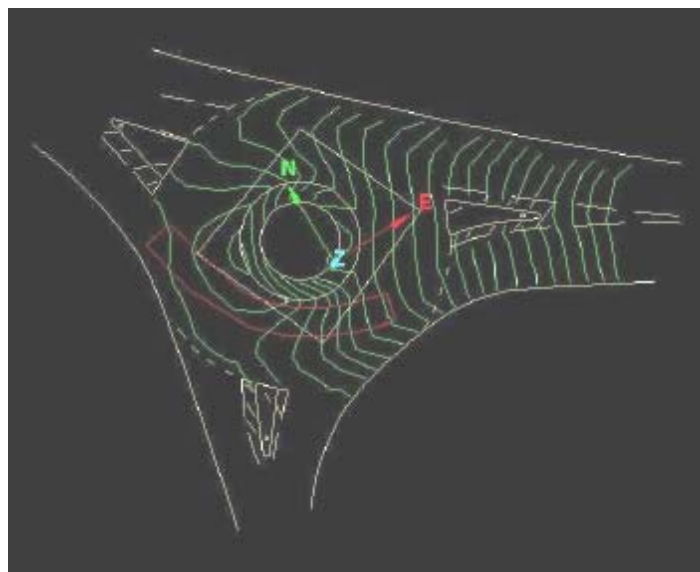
CAD plan of a road environment with line marking and road contour detail.
